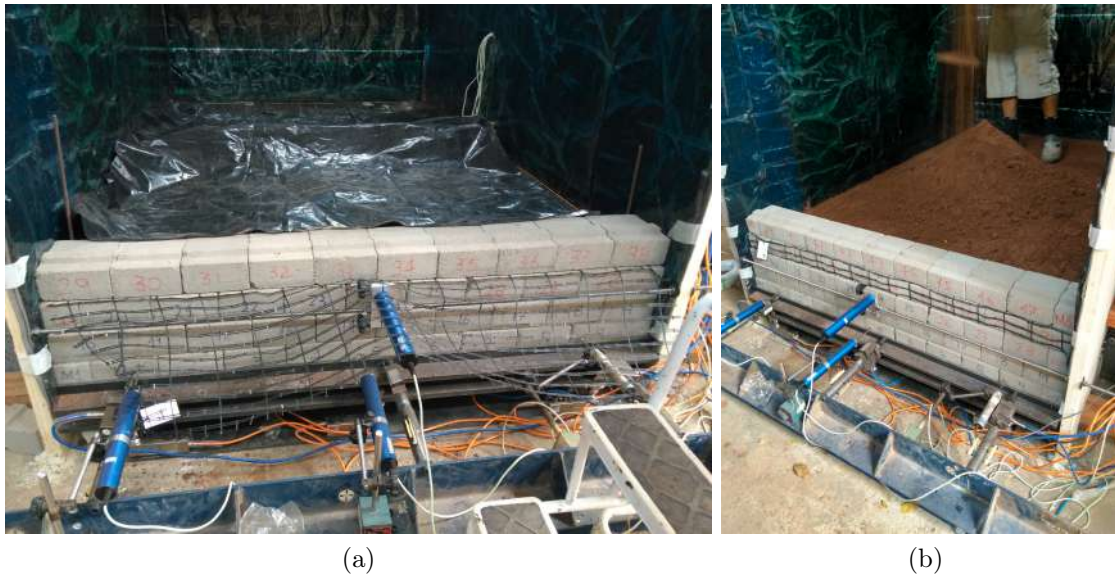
Geogrid connection to the wall facing: (a) before wrapping the reinforcement around the above row of blocks; (b) after wrapping it around.
